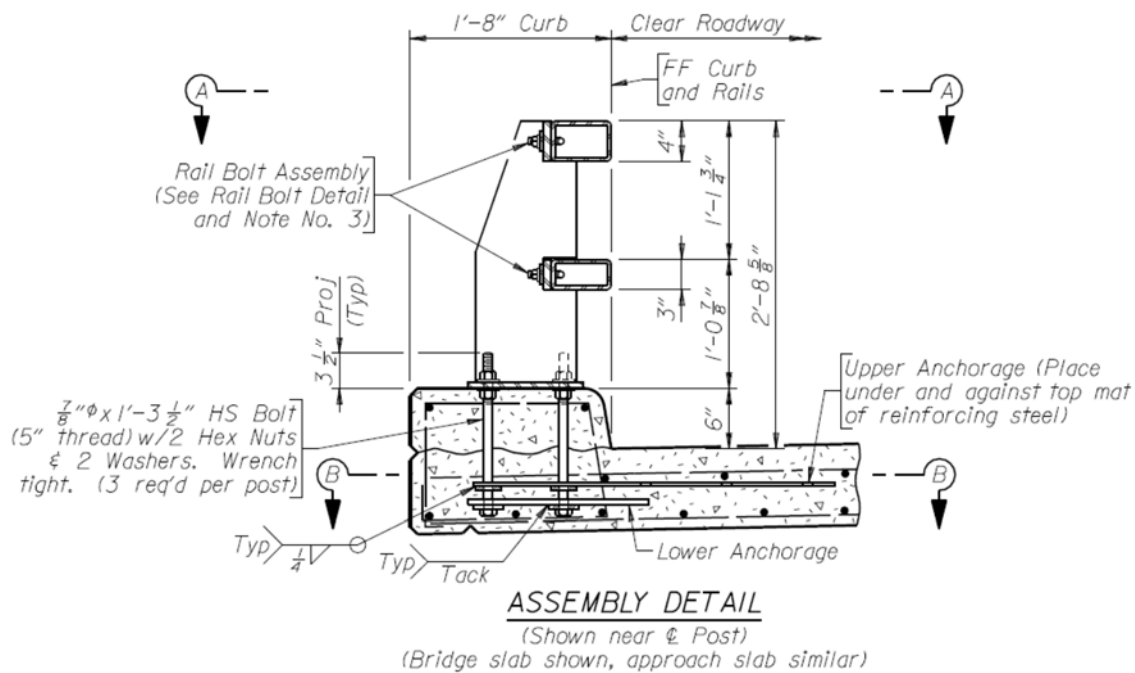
Profile of Wyoming TL-4 Bridge Rail (Excerpt from Wyoming DOT TL4 Bridge Railing Sheets)
